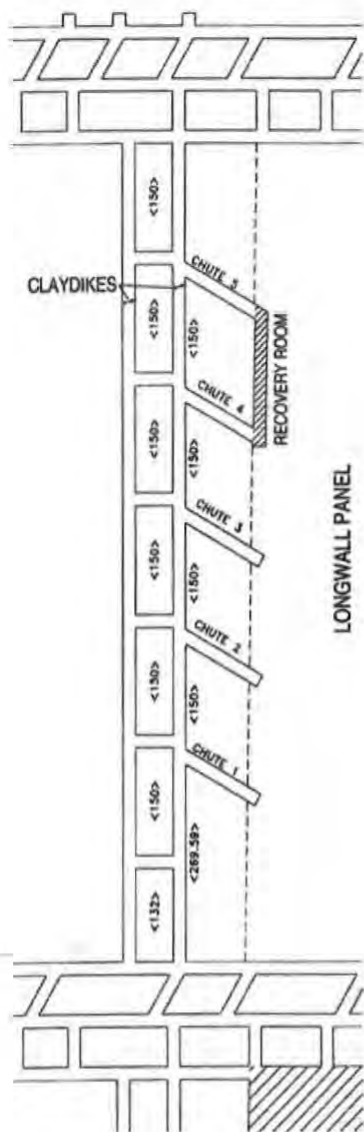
Plan view of longwall recovery area. Recovery room between chutes Nos. 4 and 5.
